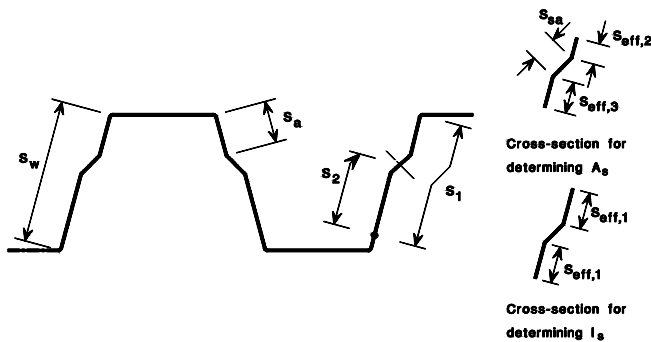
Web stiffeners for trapezoidal profiled sheeting
